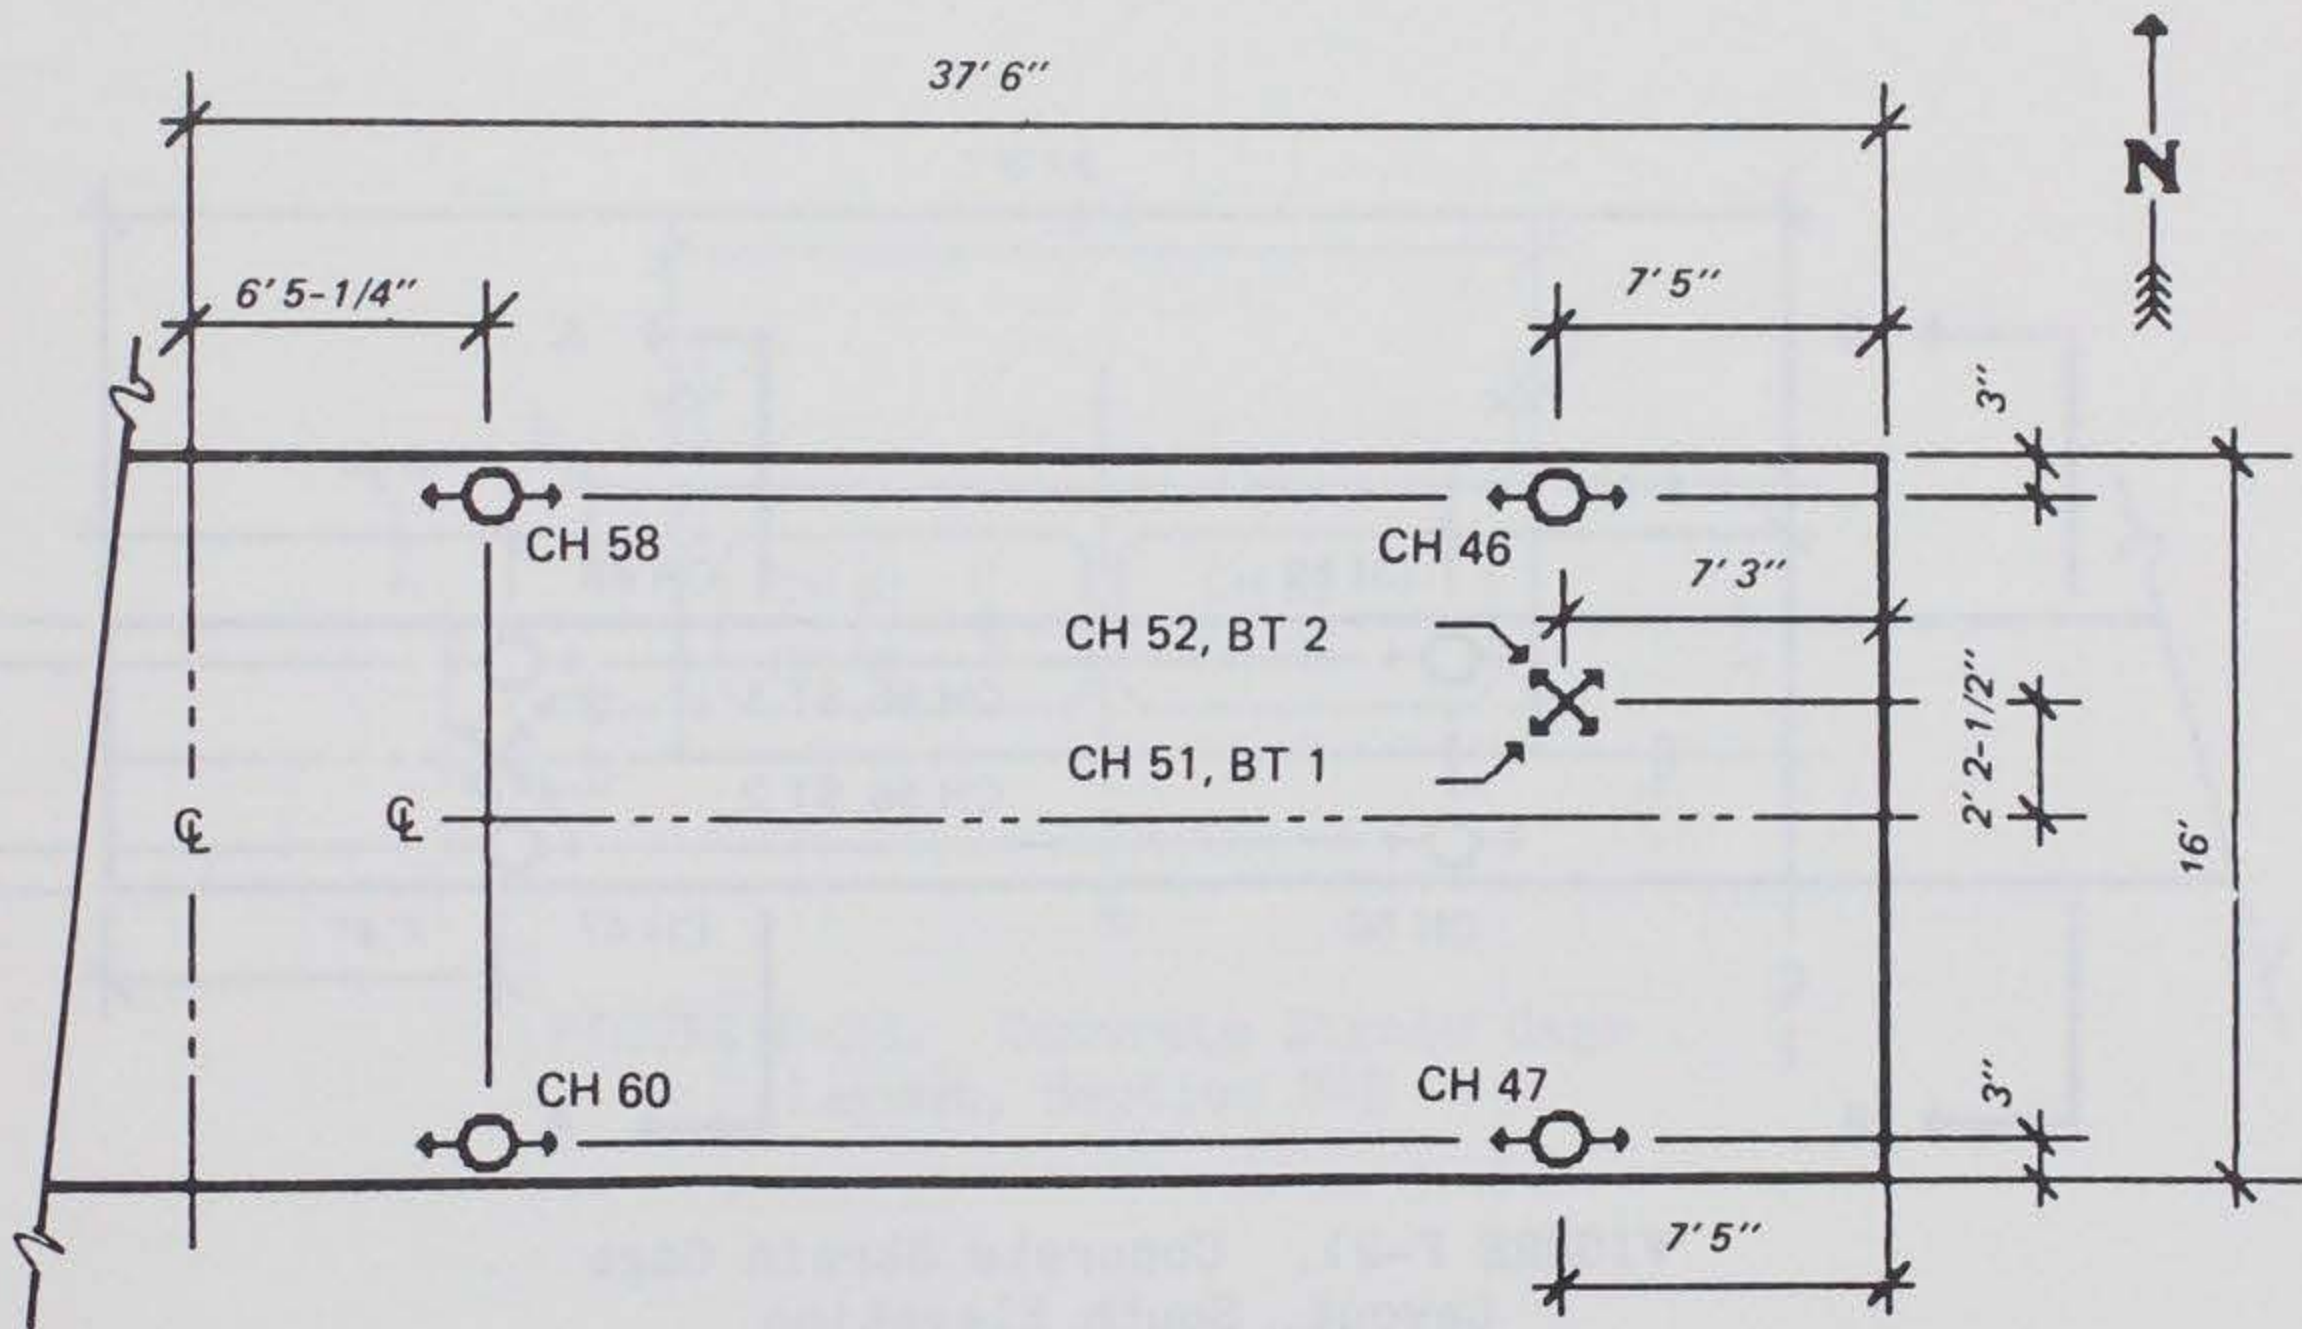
Concrete Strain Gage Layout, Bottom Plan
